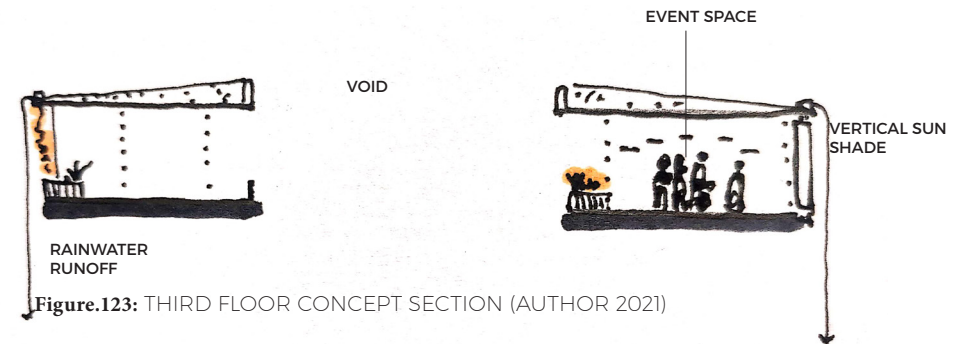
THIRD FLOOR CONCEPT SECTION (AUTHOR 2021)
